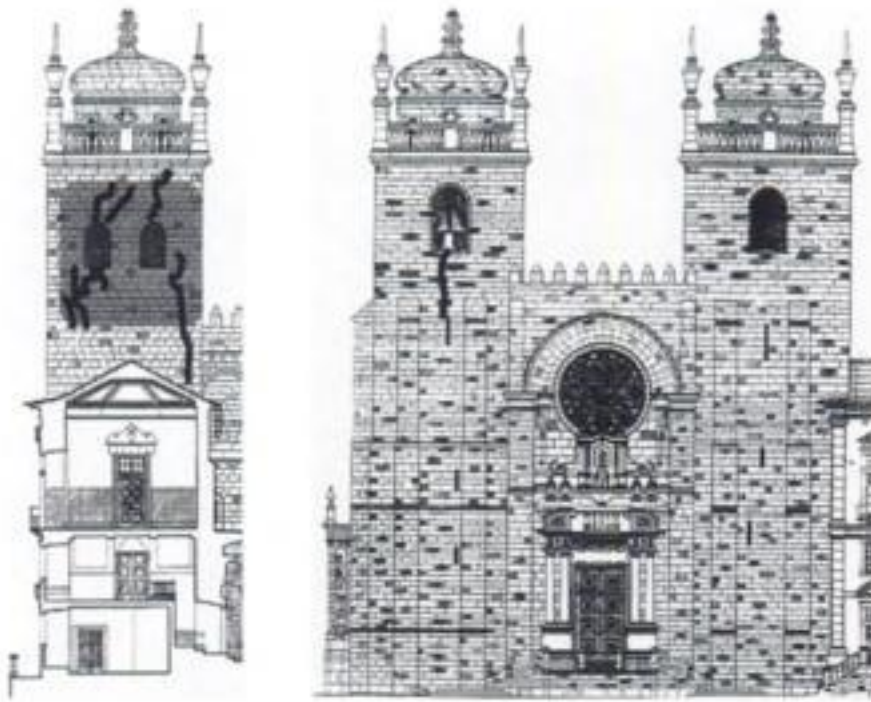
Location of most severe cracks and out-of-plumb walls, in the South view and main façade.
